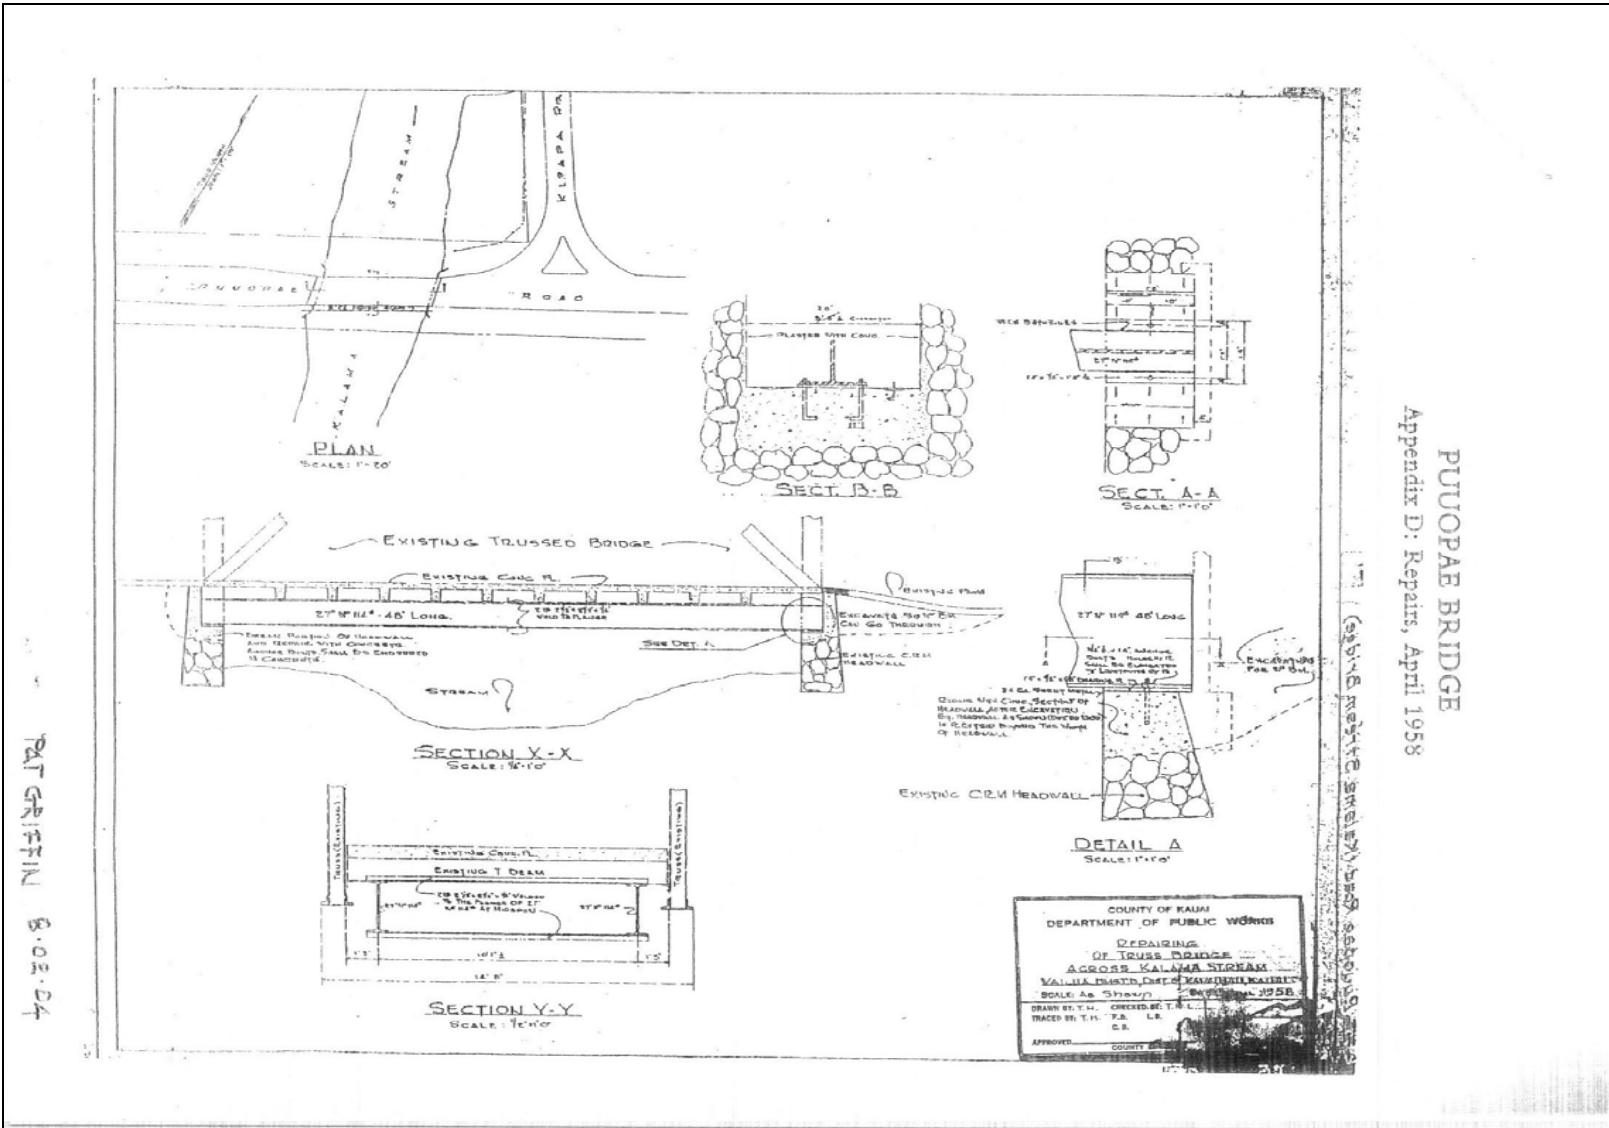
Plan View Drawing (1958) of Pu'u 'Opae Bridge Repairs.
